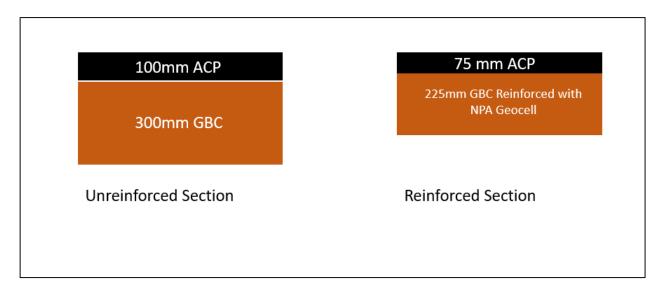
Cross section of the two alternatives considered for Village of Ryley's Main Street
